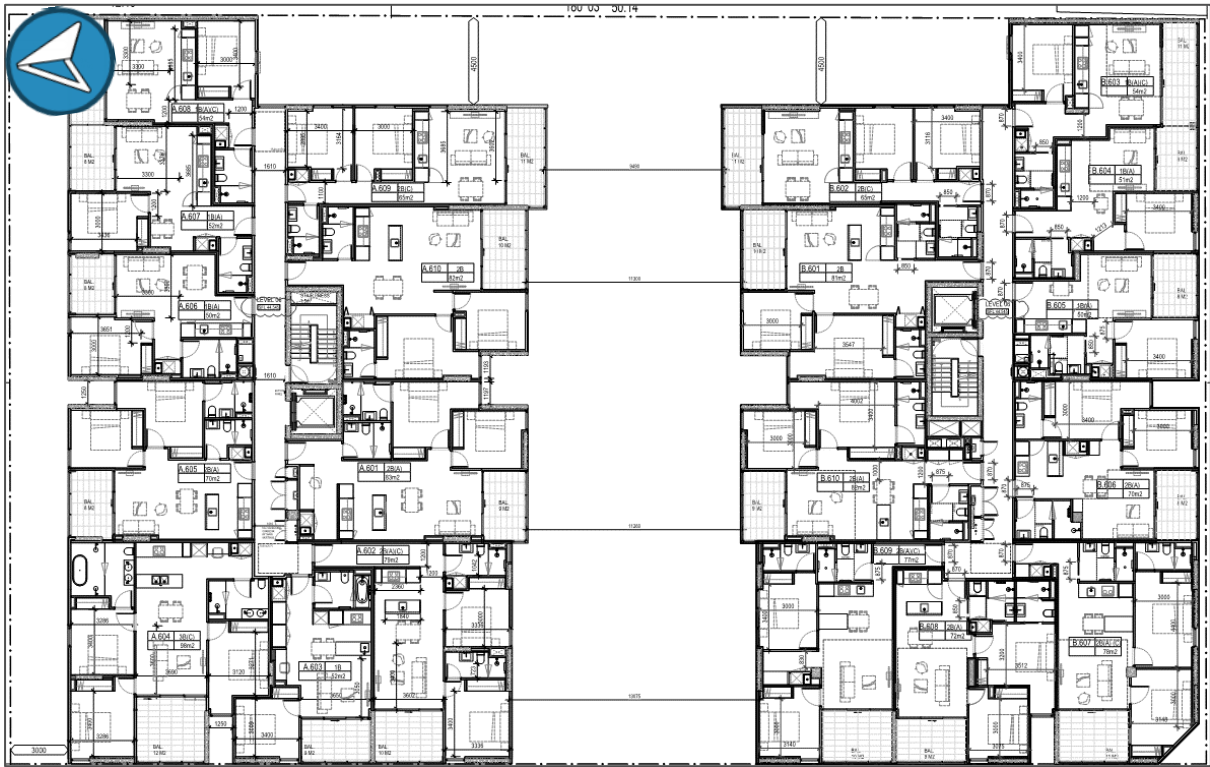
Proposed Floor Plans – Level 6 (Image Source: Artisan Architects)
